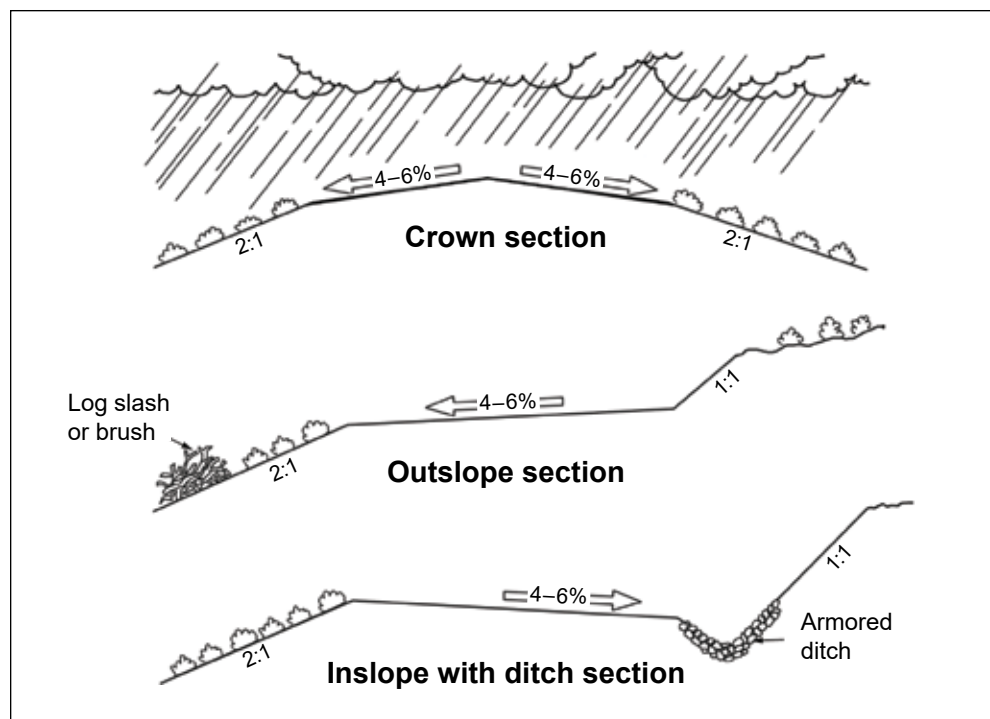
Basic road surface drainage options based on the shape of the road surface in cross-section: crown, outslope, and inslope sections. (Figure from Keller and Sherar [2003])
